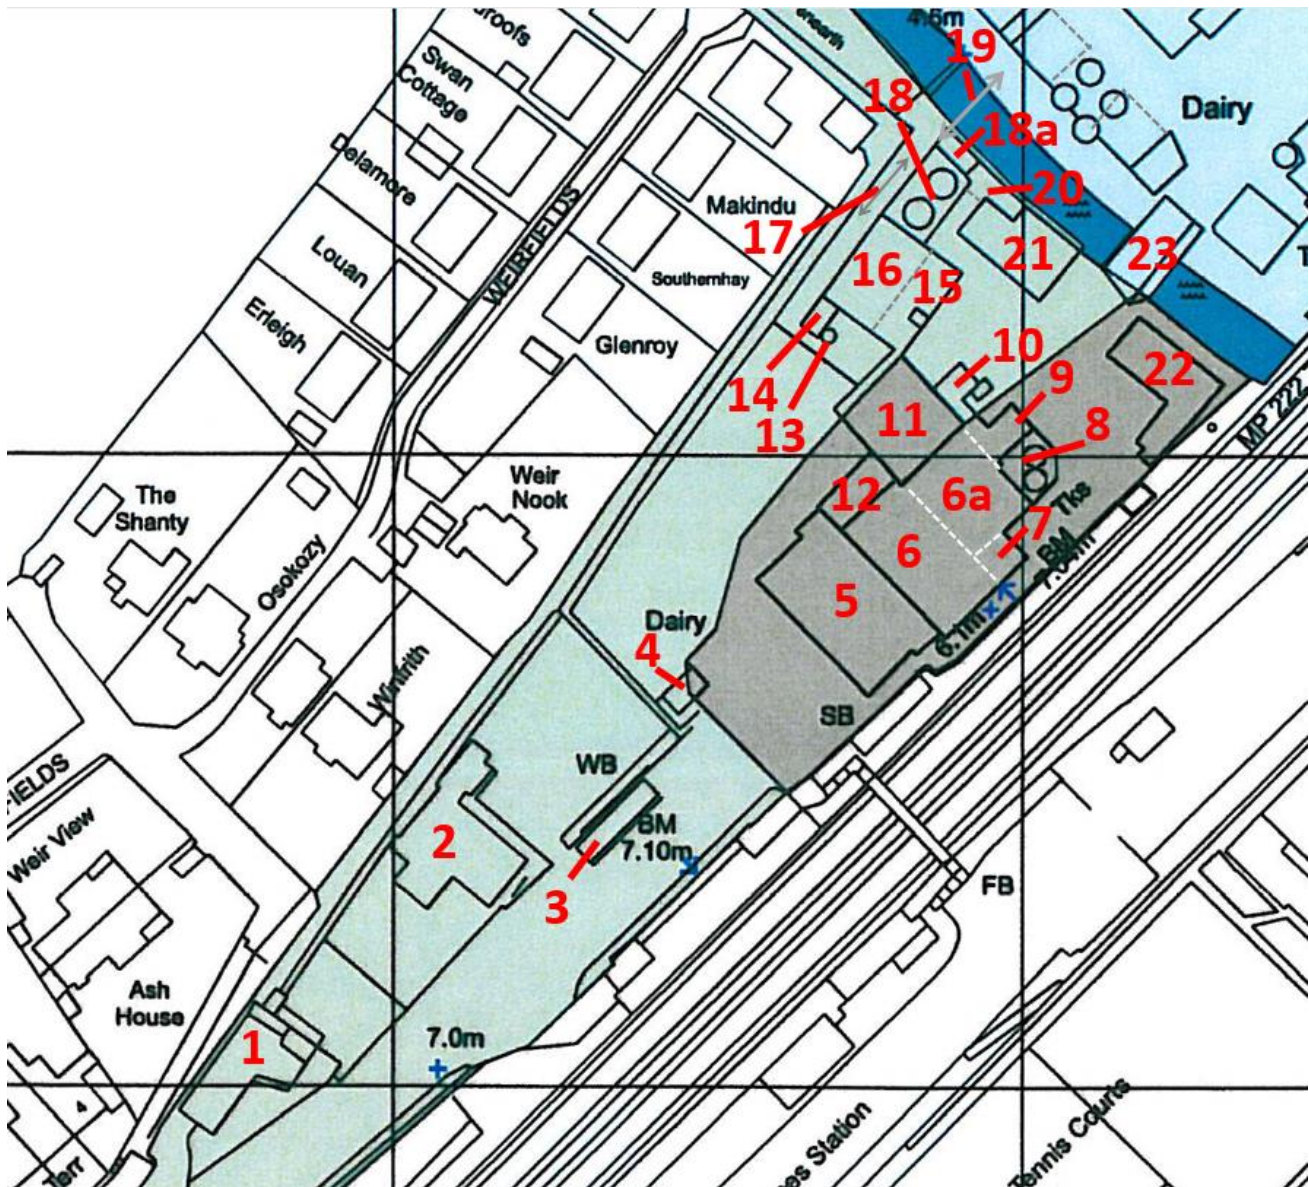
Atmos South Building site with demarcation of buildings to be demolished / retained.
